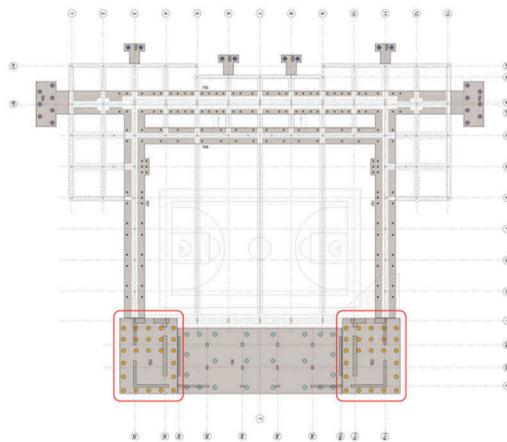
Foundation plan of the sport hall. In red the two seismic cores are highlighted.
